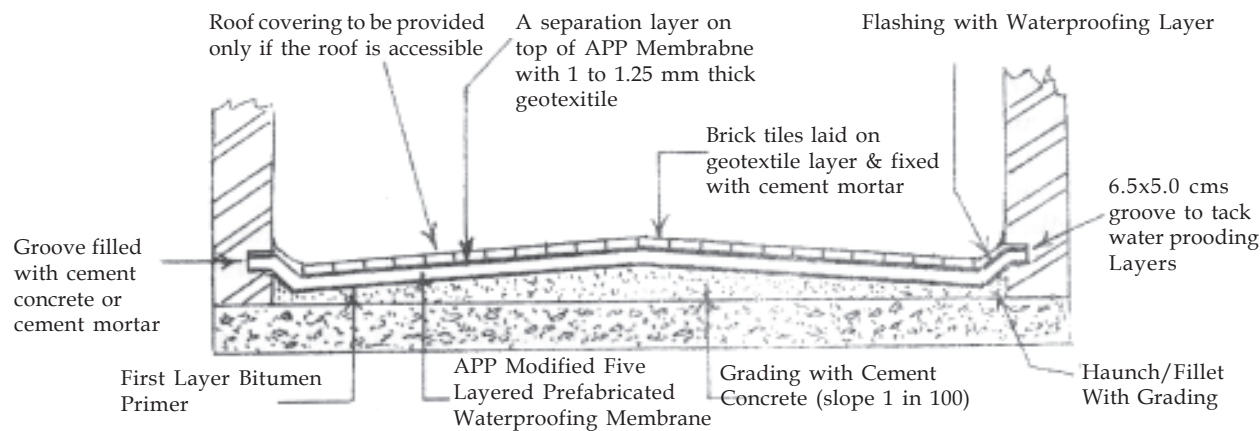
Water-proofing with APP modified Five layered Prefabricated water proofing membrane
